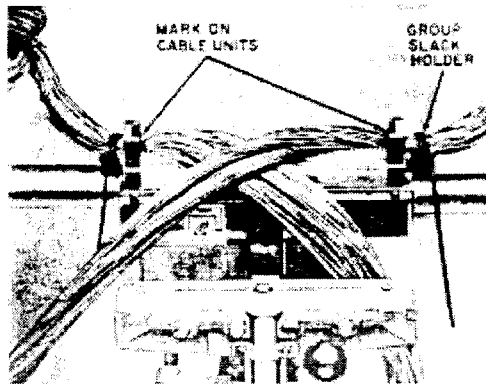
Cutter-Presser Setup for In-Line Single-Bank Splice
